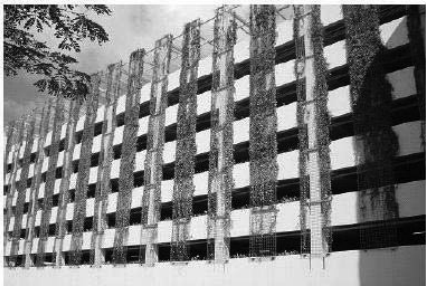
Example of Wall-Climbing green wall at Republic Polytechnic, Singapore
